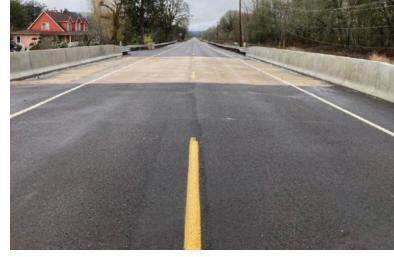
The West Fork Dairy Creek Bridge after installation of a 34-in.thick polymer concrete overlay.
